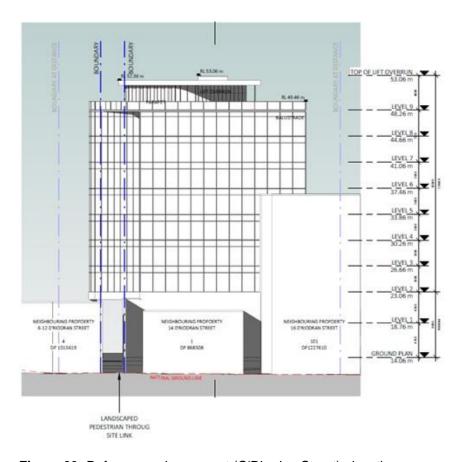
Reference scheme west (O'Riordan Street) elevation.
